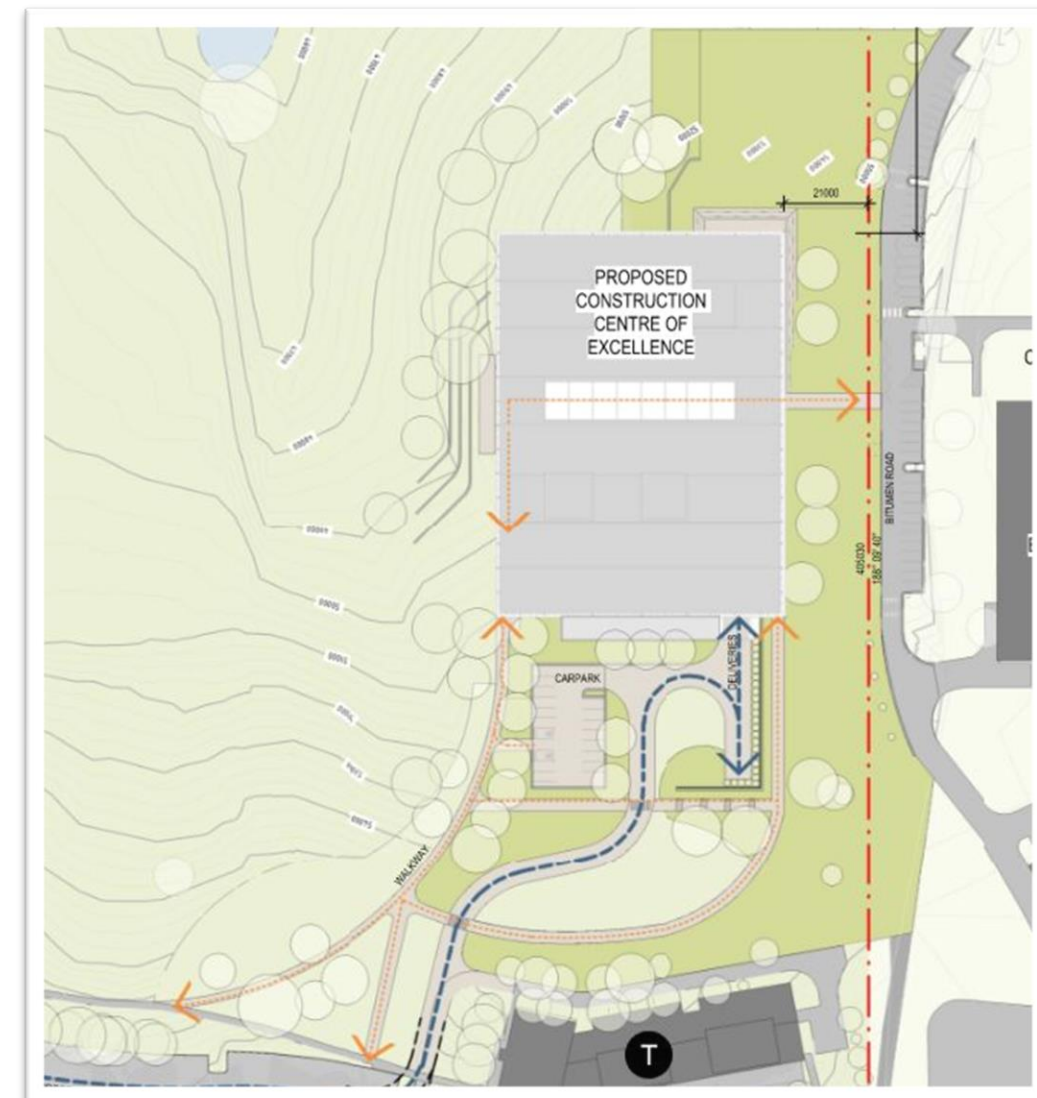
Proposed Building Layout (Gray Puksand, 2021)
